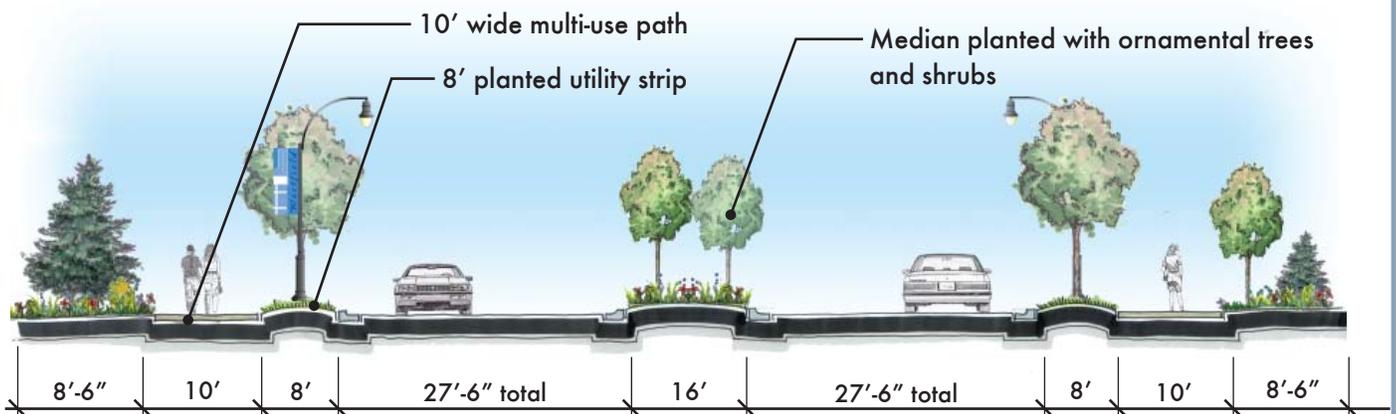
Typical cross-section illustrating how multi-use paths are incorporated into each road section.
